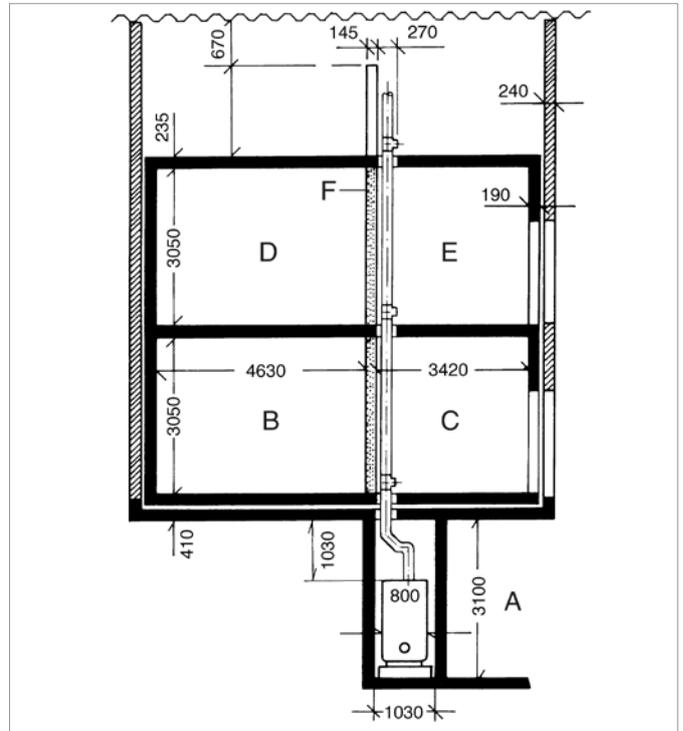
Installation set-up of the Fraunhofer Institute for Building Physics (all measurements in mm)
